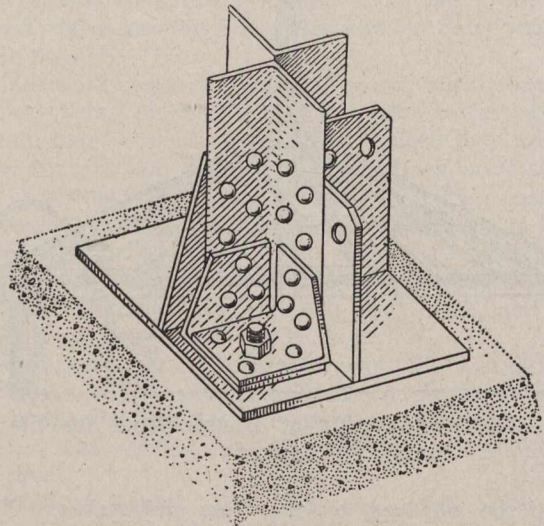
Typical Construction of Footing for Angle Iron Column.
